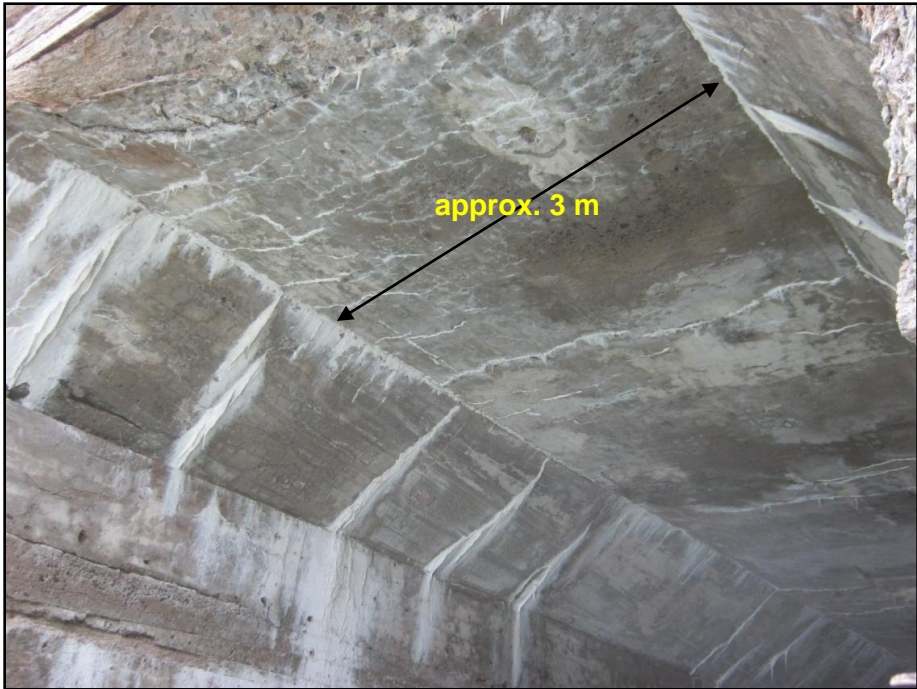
Ceiling of box culvert at south entrance on April 29, 2014.
